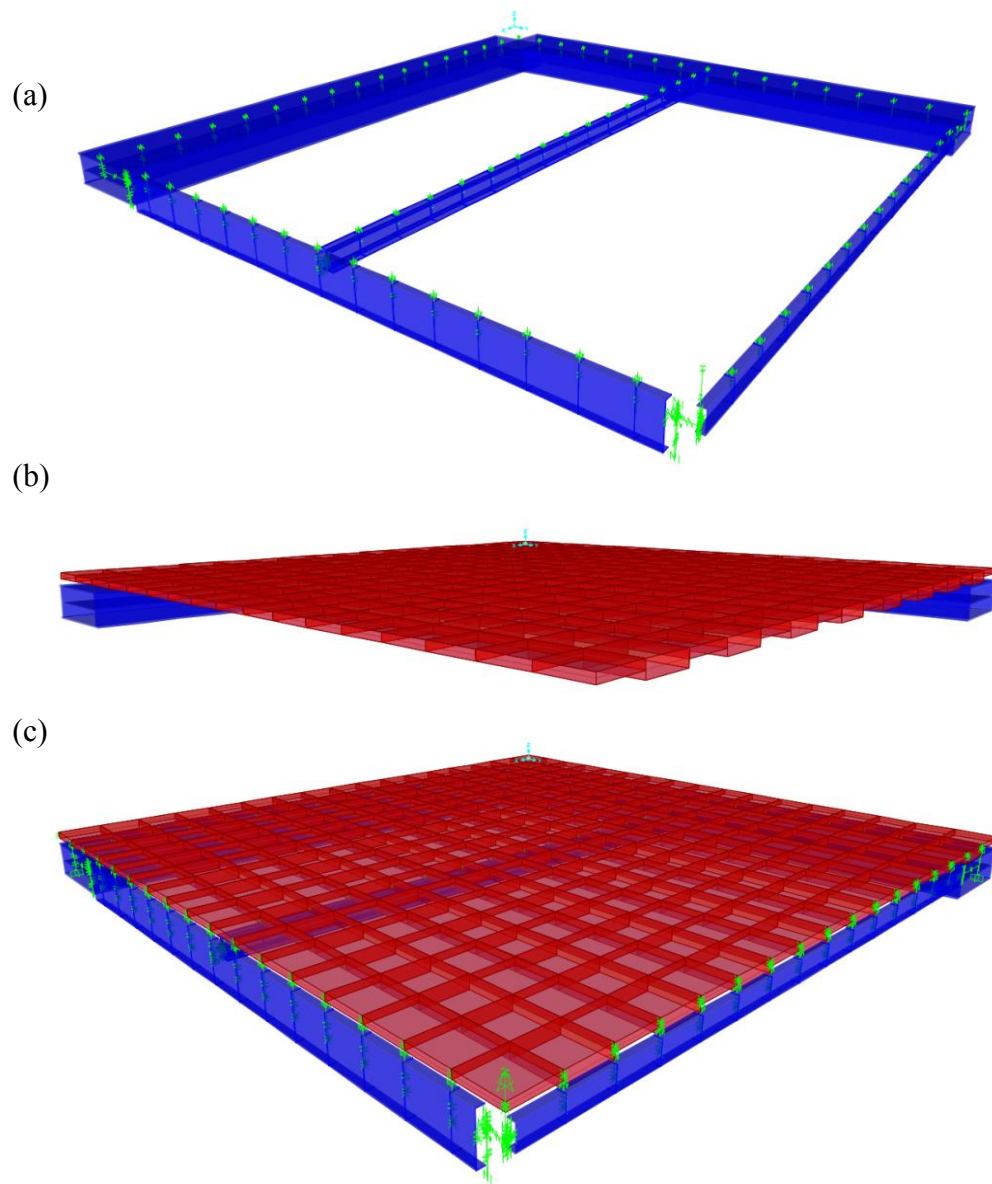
Simplified SAP2000 models of different floor systems: (a) bare steel frame model; (b) ribbed slab model with surrounding edge beam; (c) fully composite steel-reinforced concrete floor system model
